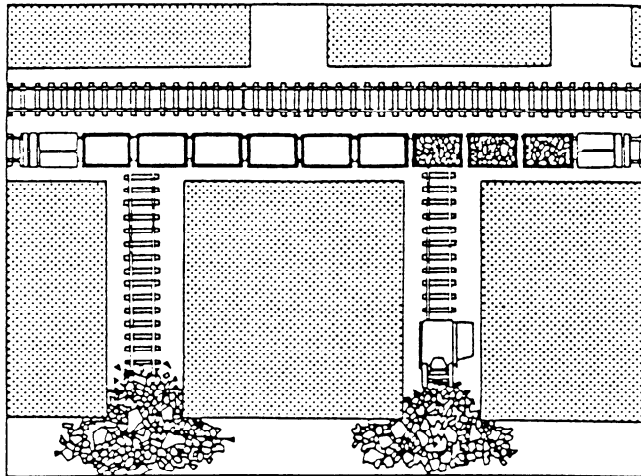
Track-mounted loading system for sublevel stope (Bjorkstedt, 1981).
